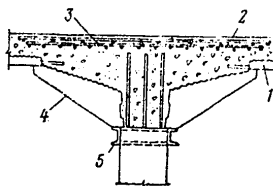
Prefabricated monolithic beamless shelter ceiling assembly. 1 -- prefabricated flat slab; 2 -- monolithic reinforced concrete; 3 -- fittings above the support; 4 -- prefabricated capitals; 5 -- mounting table
